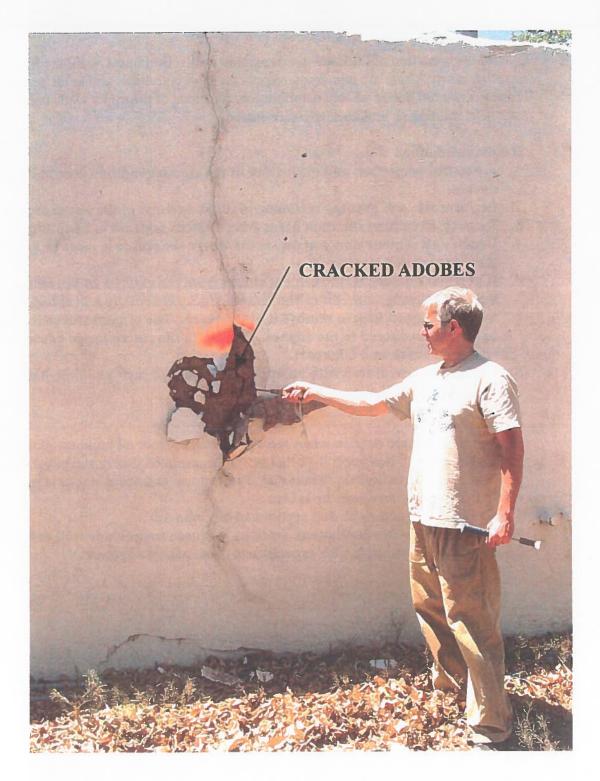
Structural Adobe Wall Separation and Stucco Crack East Adobe Wall
